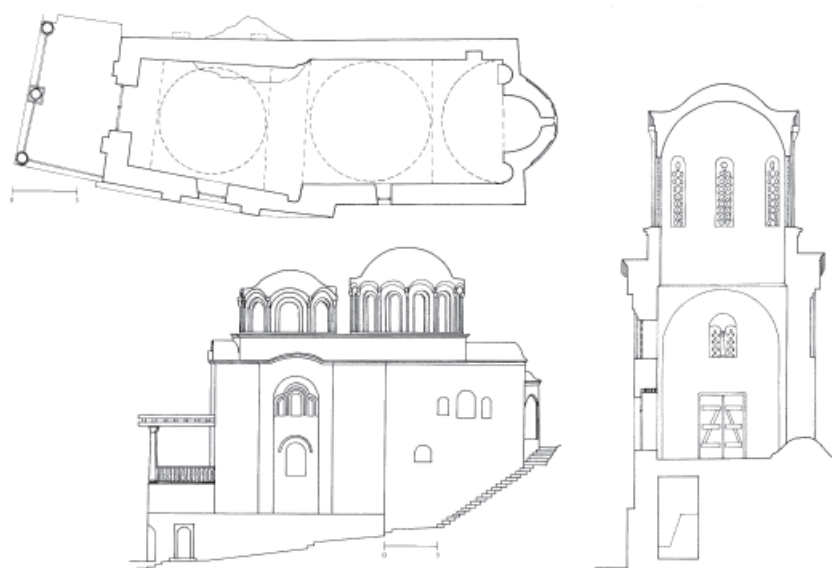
Prilep, Church of the St. Archangel Michael, Plan, section and hypothetical reconstruction of the south façade.
